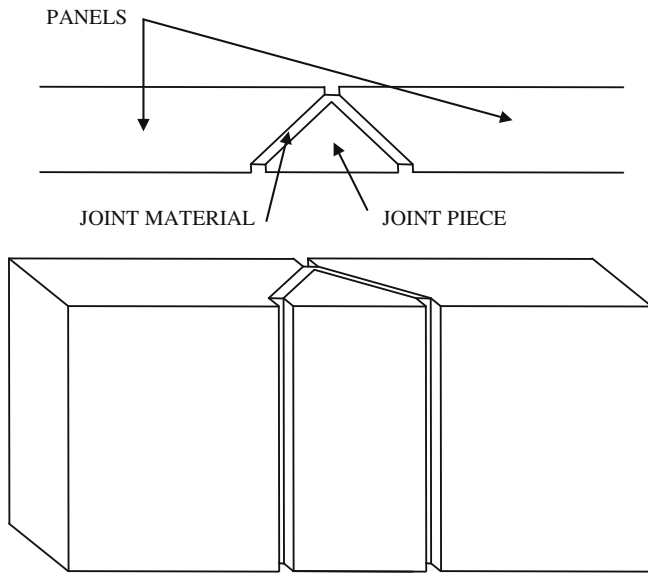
New vertical joint design for architectural panels. Horizontal section.
